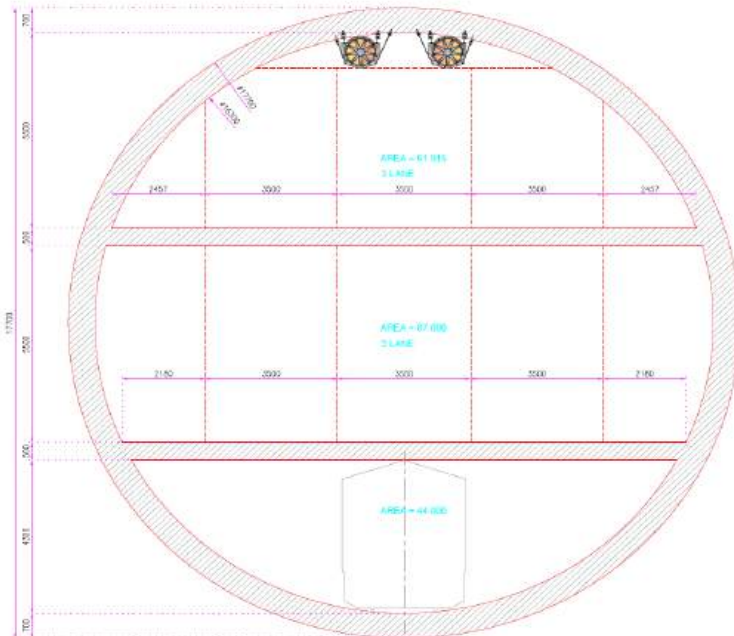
6-lane Road TBM Tunnel Typical Cross Section
